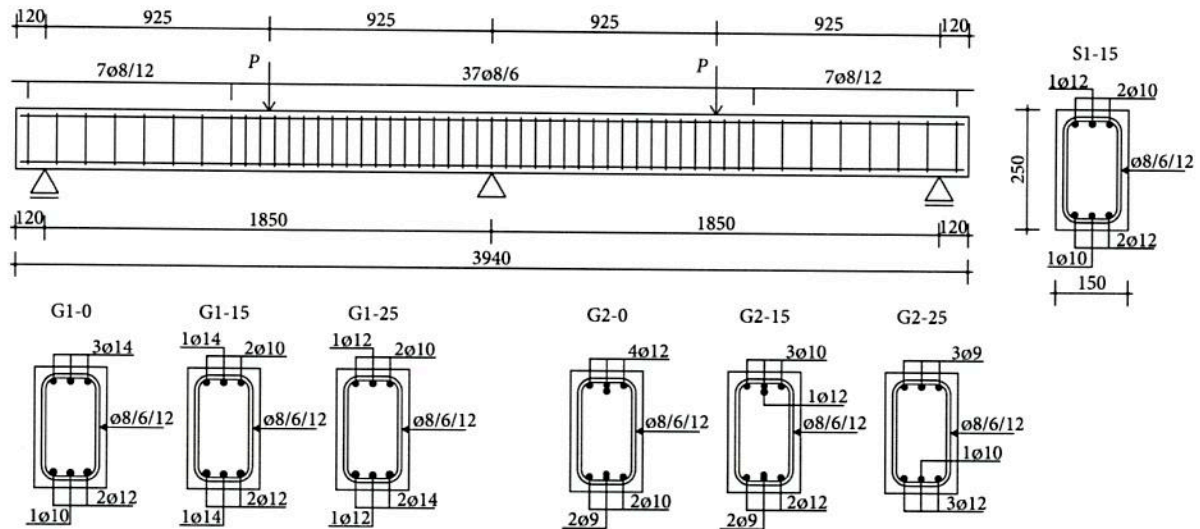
Geometry and reinforcement details for tested beams (all dimensions are in mm).
